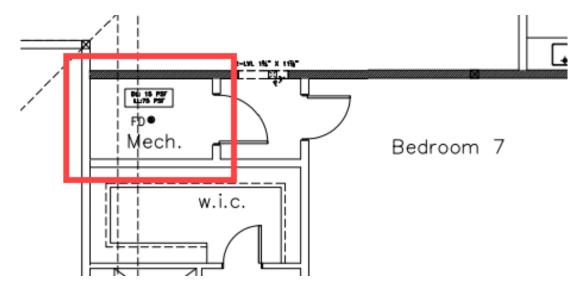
City-approved mechanical/HVAC plans showing 1 mechanical room on 3rd floor
